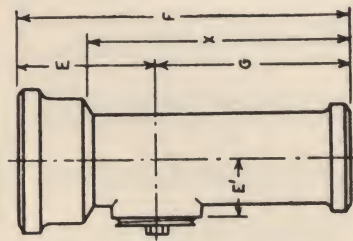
T branch cleanout with screw plug (table XXI).
